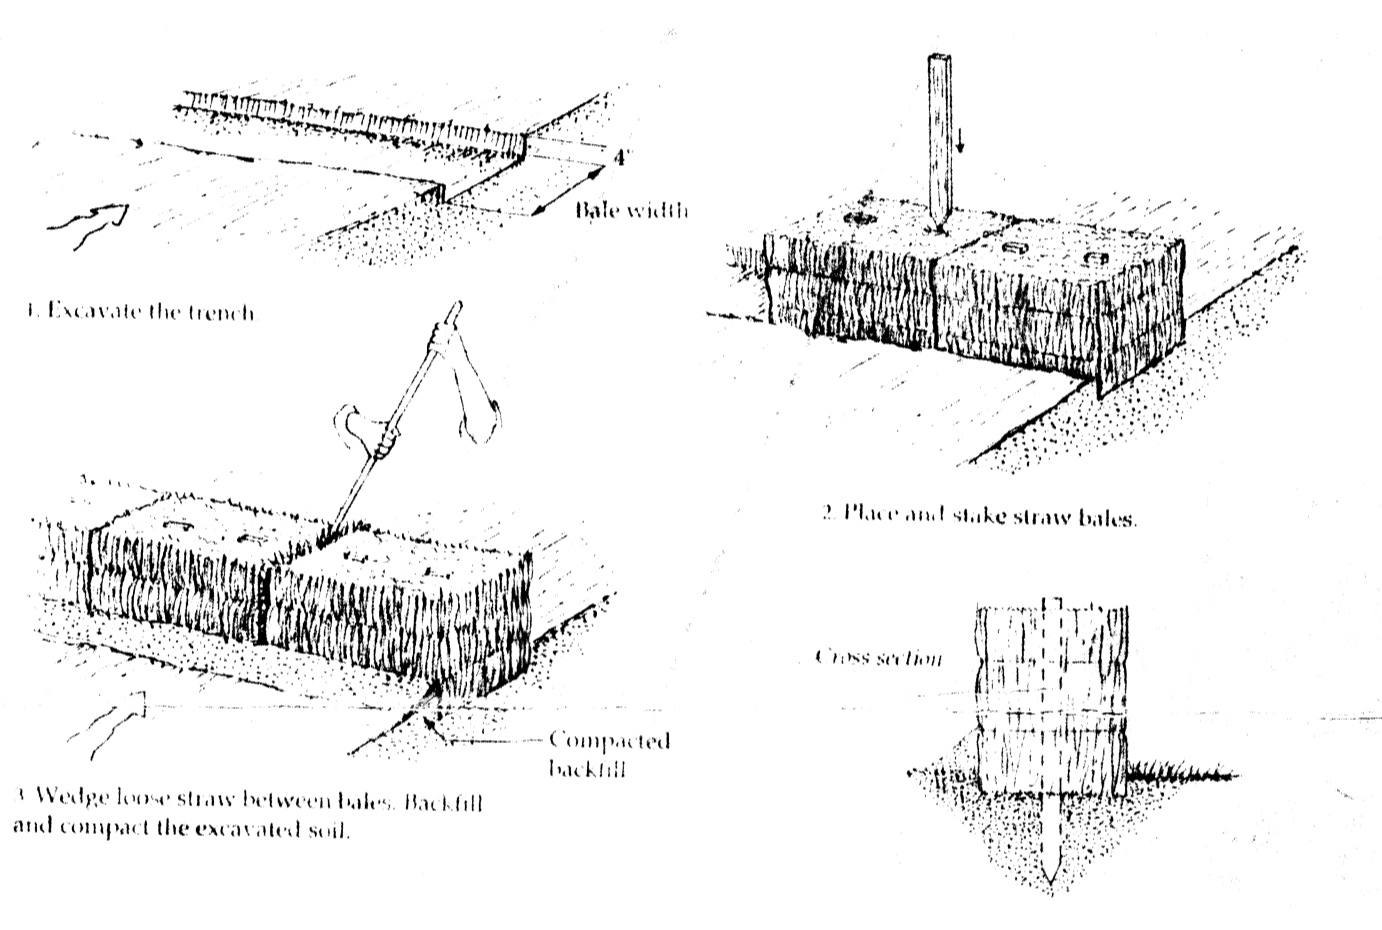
Placement and Construction of a Straw Bale Barrier
